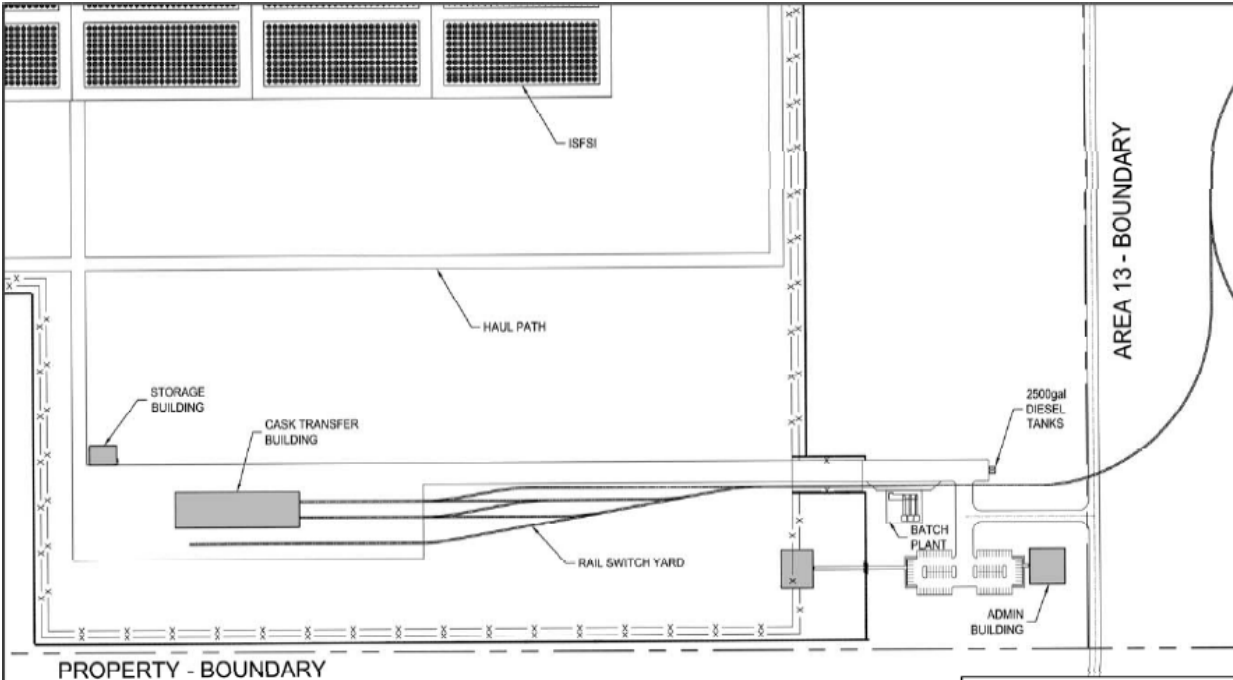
Proposed Project Building Layout (Source: Holtec, 2019a)
